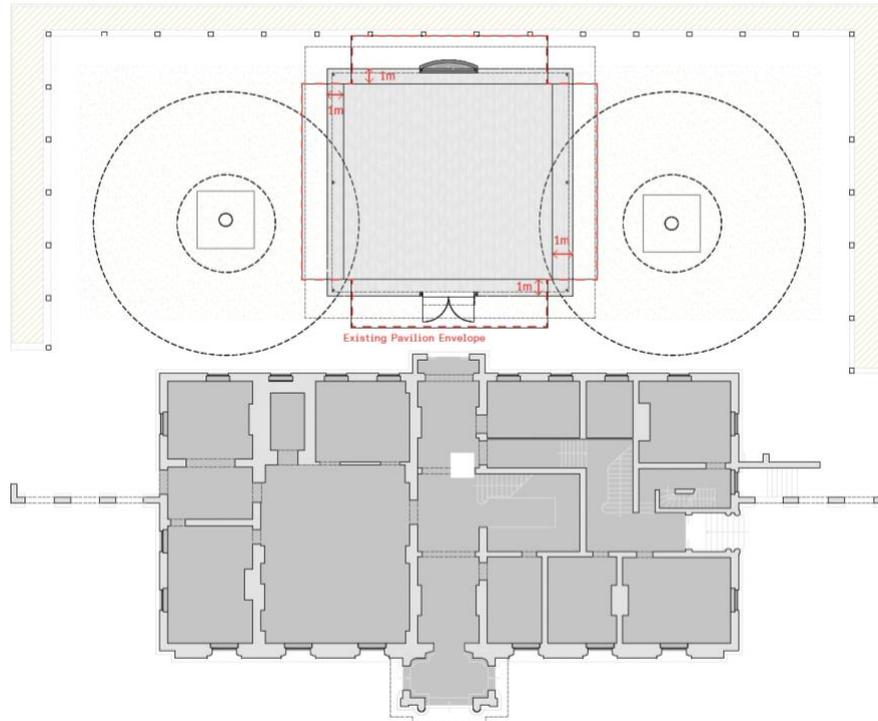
KUD Plan 24-016 Hellenic Museum drwg 3; showing an outline of the existing Pavilion, the new pavilion and the former administration building.
